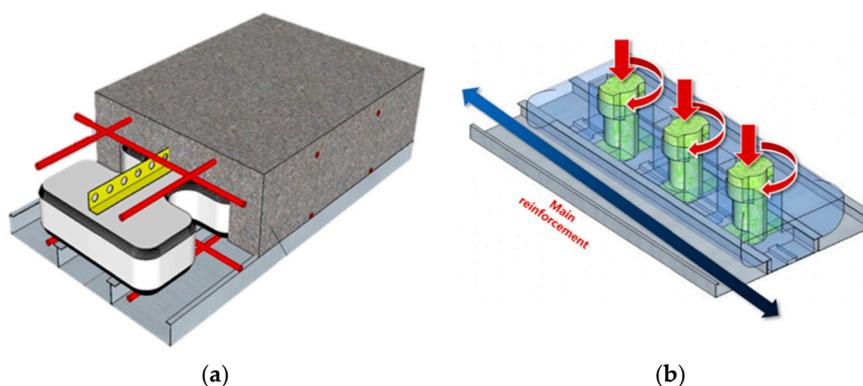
Description of the voided slab system: (a) Schematic of the voided slab system, (b) Anchoring mechanism of the voided slab system.
